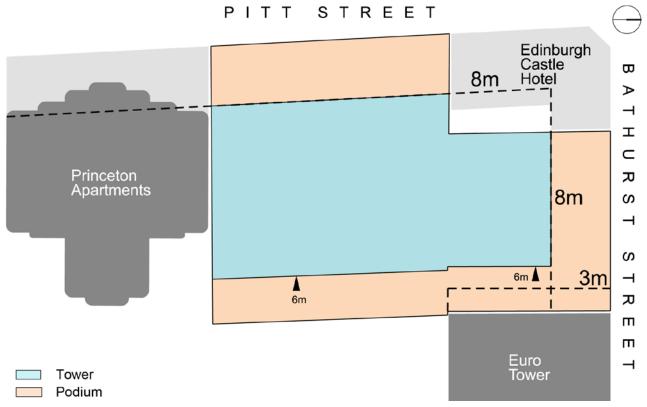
Indicative above-podium building envelope plan of Envelope Option 1
